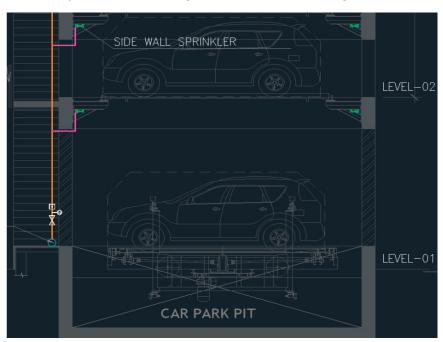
Section layout of side wall sprinkler facing the car bonnet / engine
